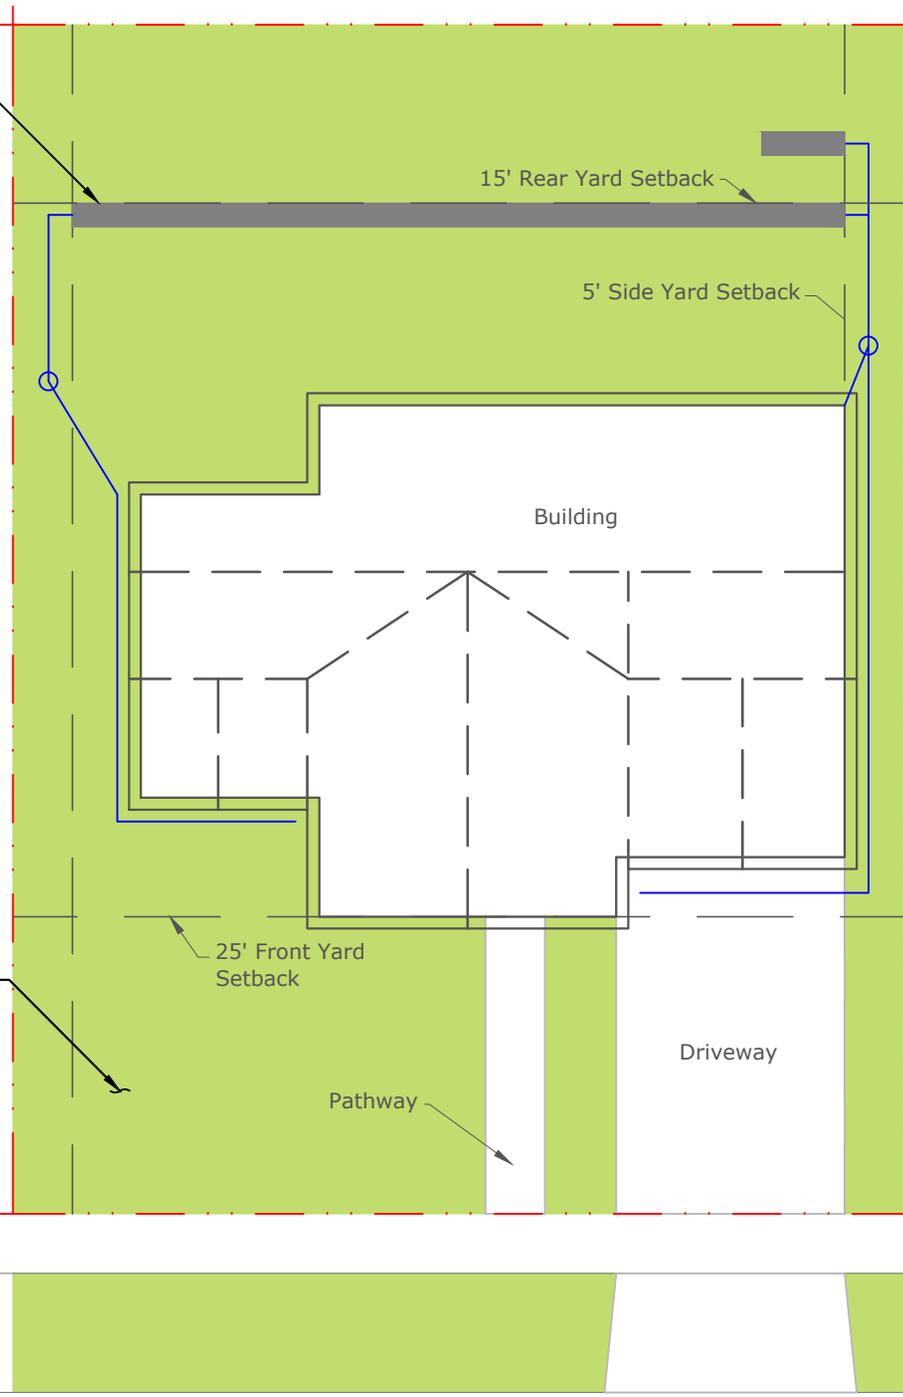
Scenario 1. Permanent Stormwater Site Plan – Typical Single-Family Residential Parcel, 2005 Requirements, Outwash Soils
